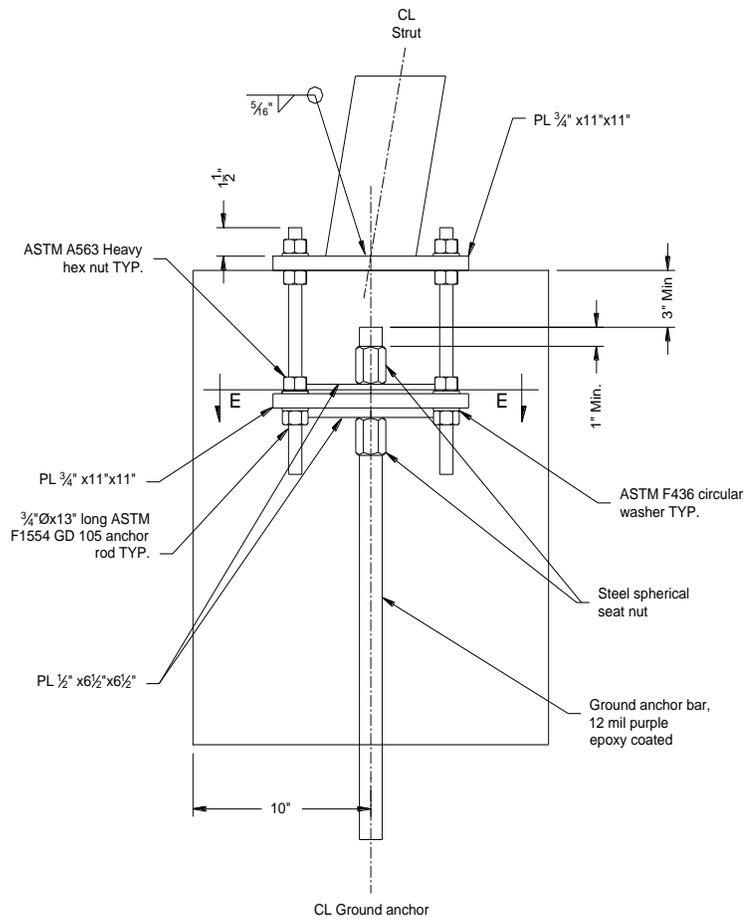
Snow supporting structure lower strut foundation and connection to ground anchor for case of CIP footings.
